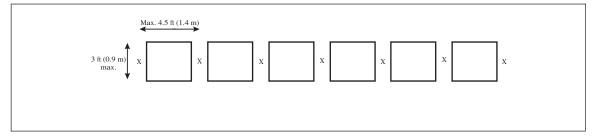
Plan view of alternative in-rack sprinkler arrangement for single-row racks up to 3 ft (0.9 m) deep
